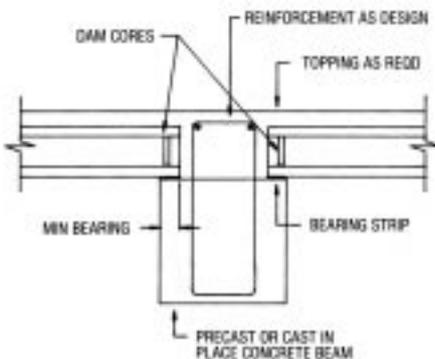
TYPICAL BEARING CONNECTIONS TO CONCRETE BEAMS
